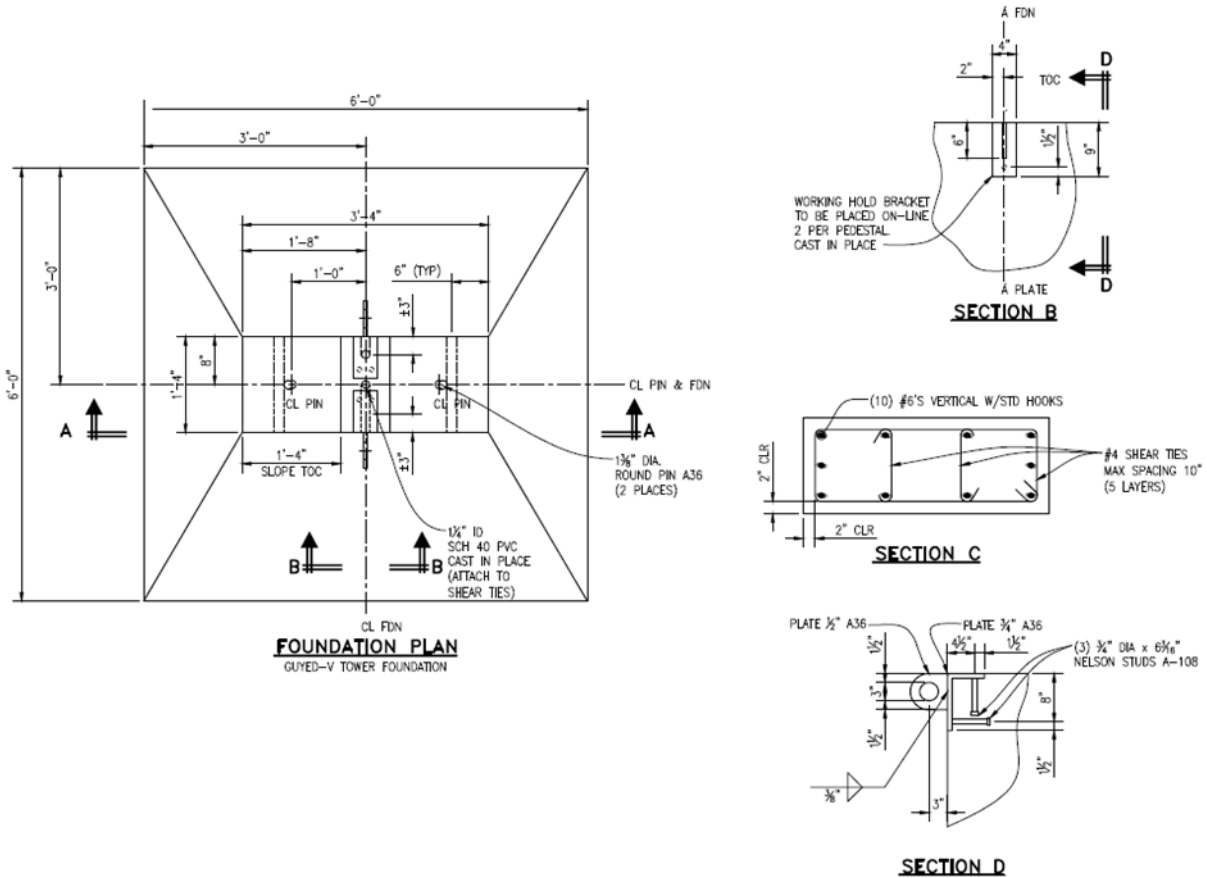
Aluminum Tower Concrete Foundation, Guyed V Tall (026-82455)
